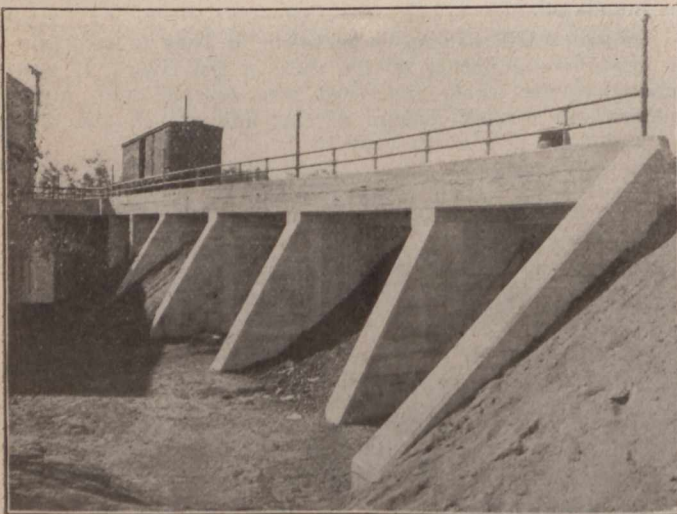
COAL POCKETS IN CUT-OFF WALL
